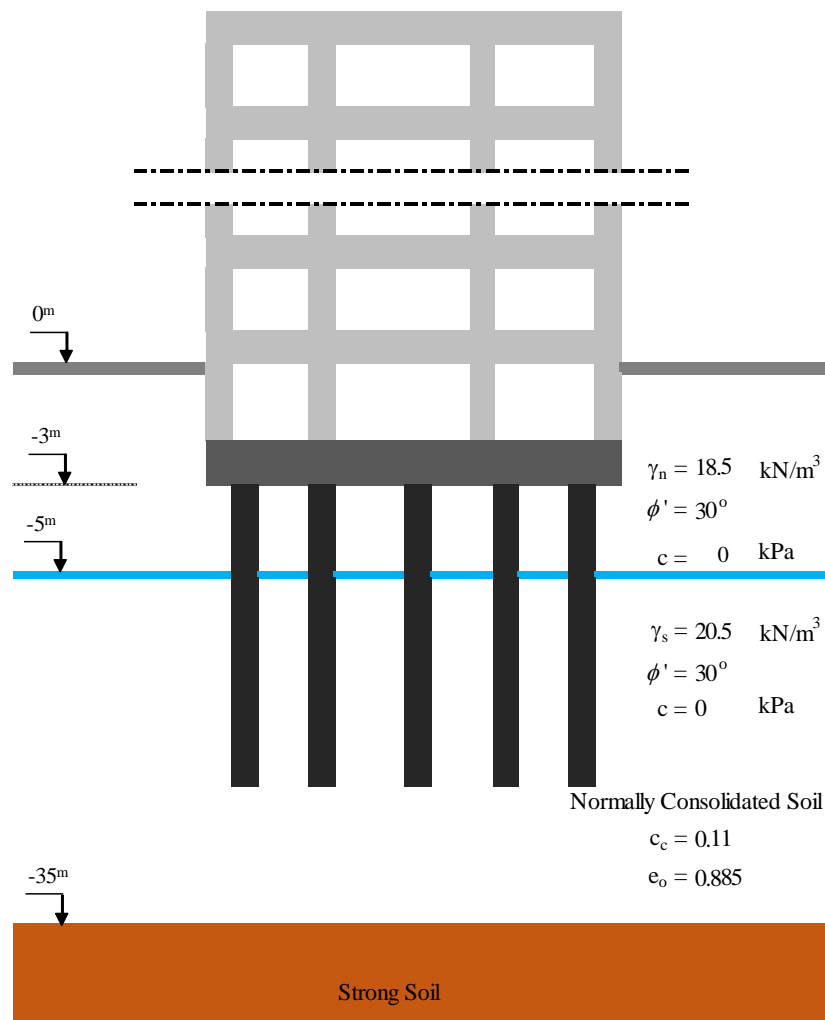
Considered hypothetical building, pile foundation and soil profile.
